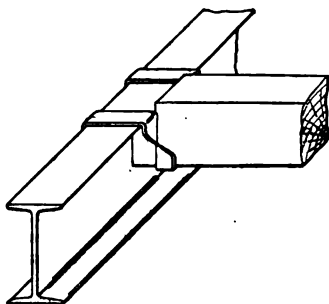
Wooden Beam Framed to I Beam with Stirrup-hanger
